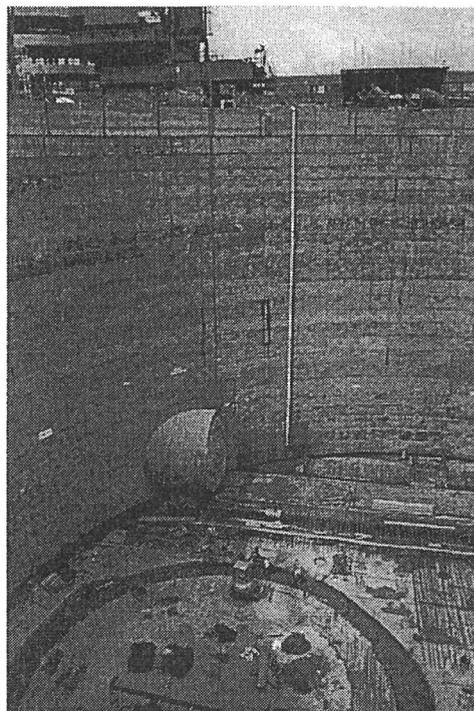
Base slab construction (Incorporation base of FDA shaft as VE alternative. Early tunnel breakthrough also evident).
